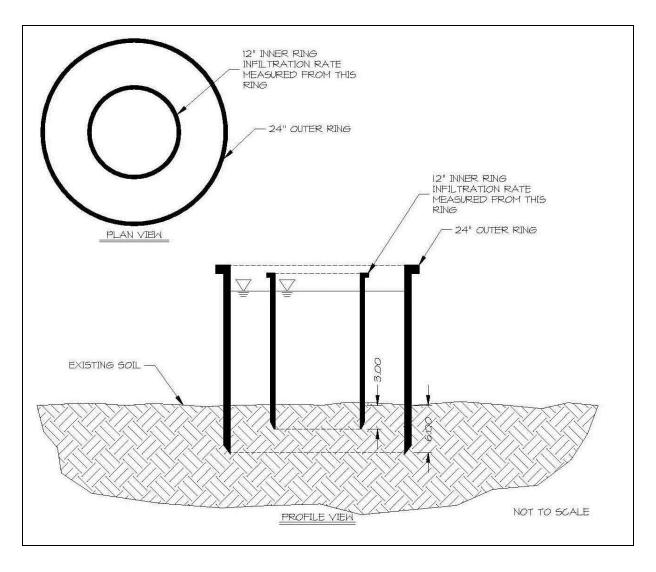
Plan and Profile View of Infiltration Test Apparatus
